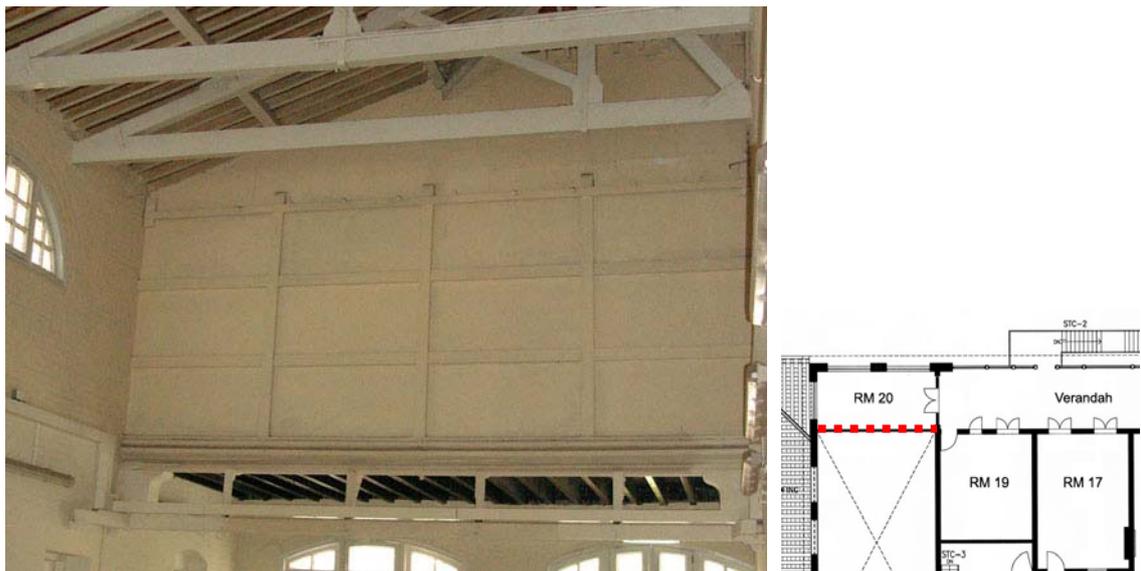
The wall partition of RM 20 viewed from RM 6 at the main building.
